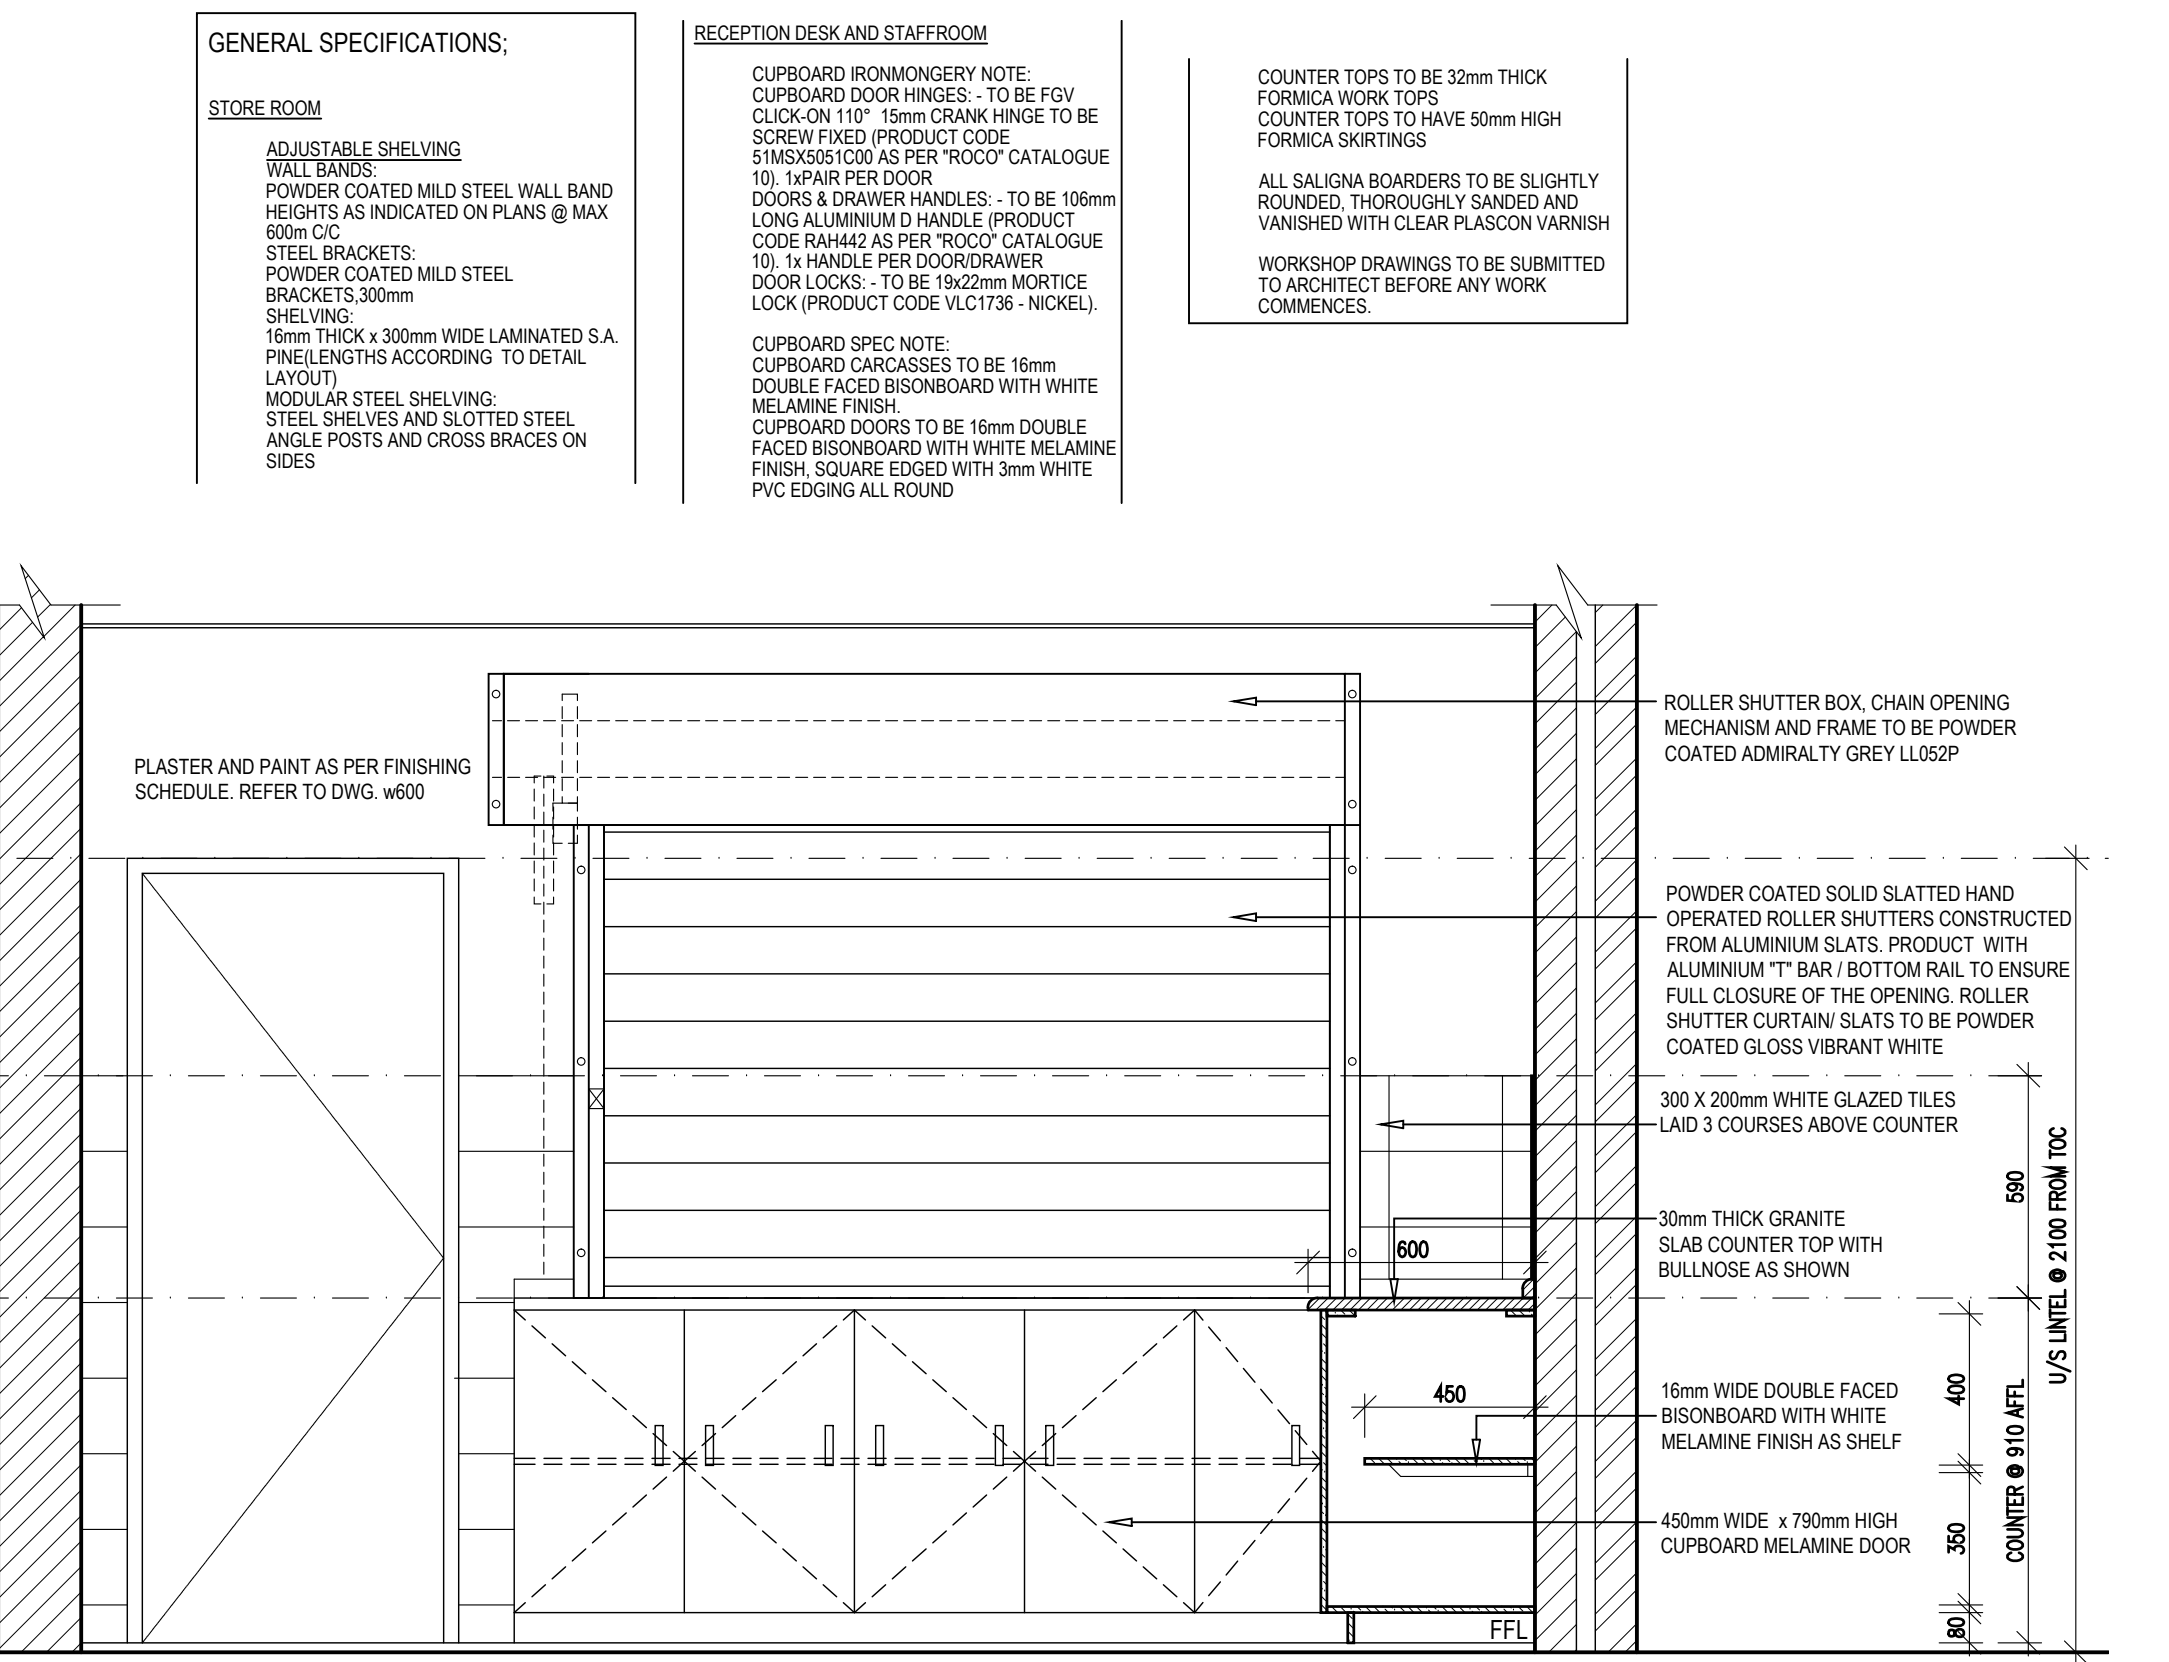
SECTIONAL ELEVATION A SCALE 1:20
